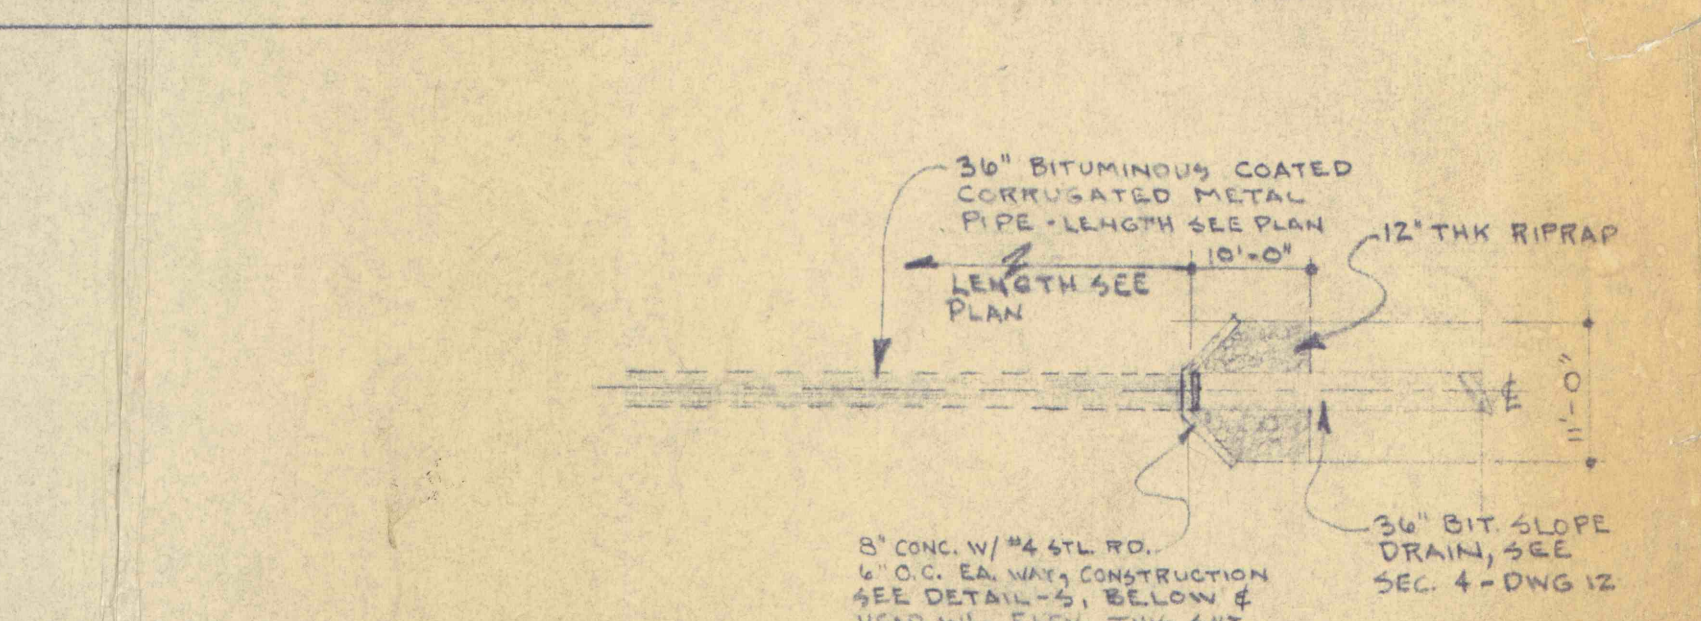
DETAIL OF CONNECTION DITCHES "A" & "B" - (J)
